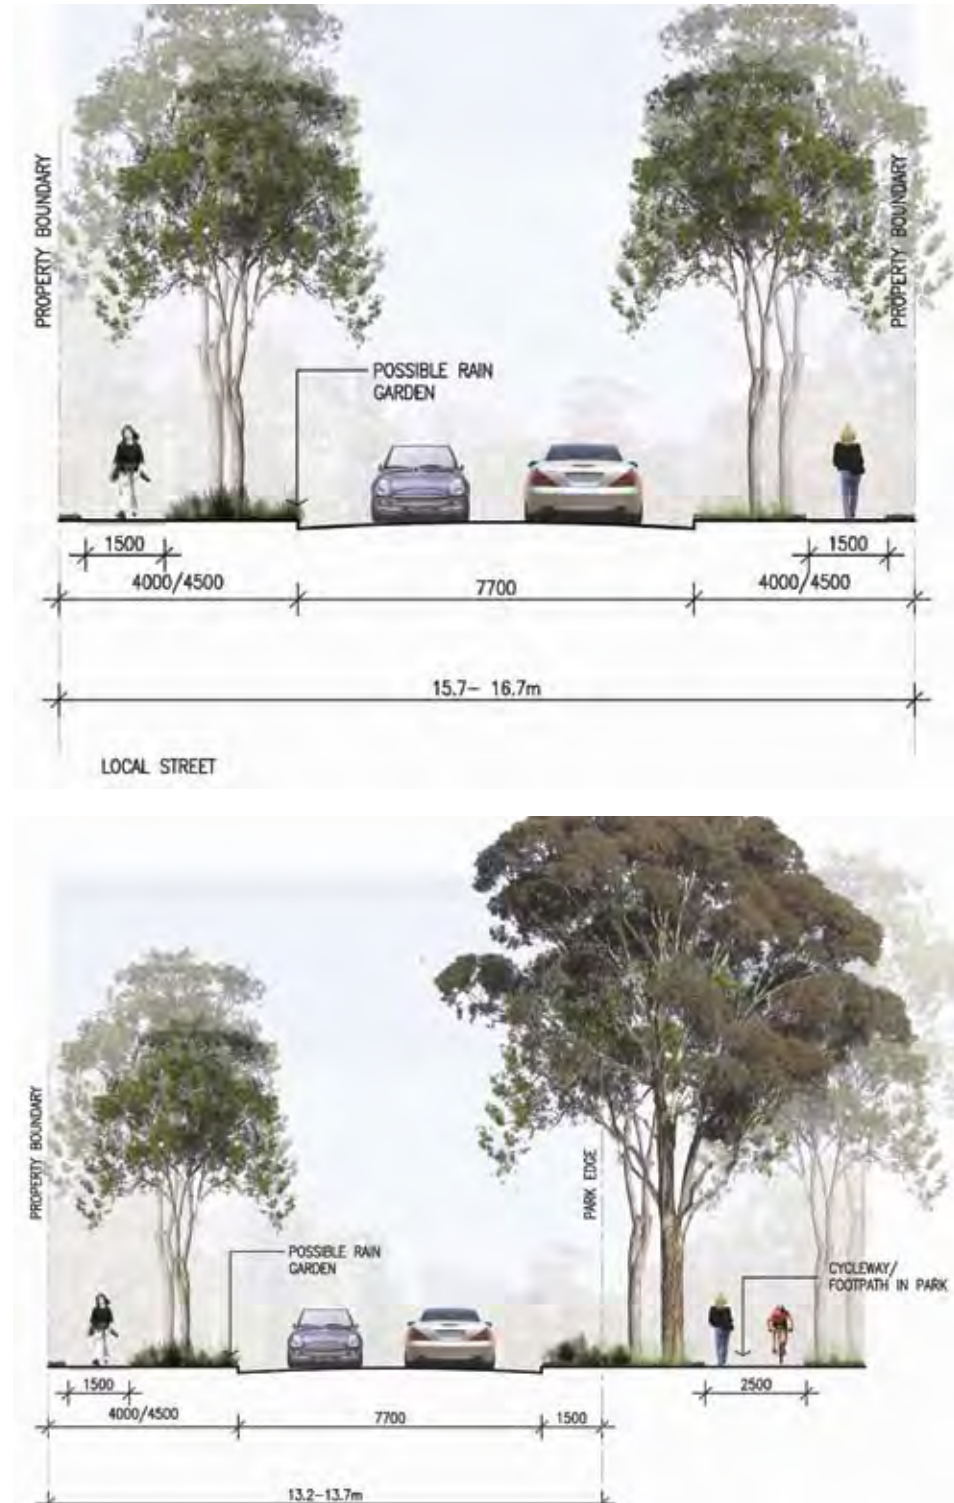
Stage 1 Residential Village - Road Carriageway and Reserve Widths
